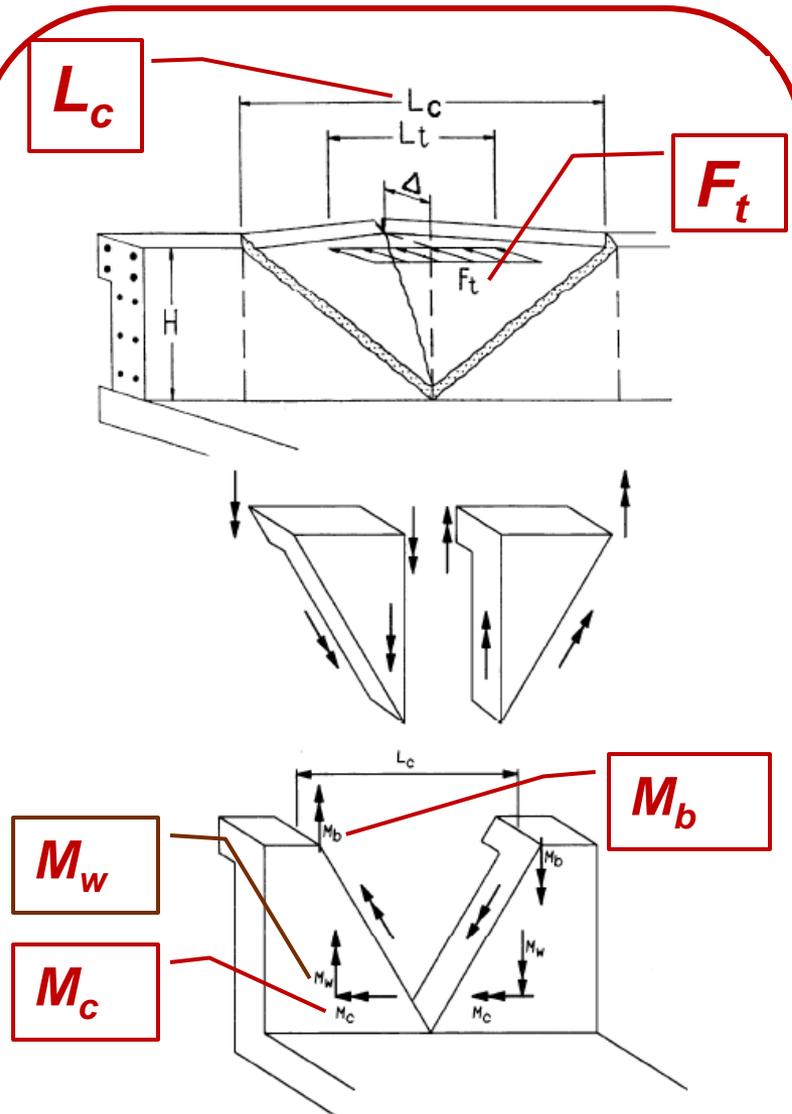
Yield Line Analysis of Concrete Parapet Walls for Impact within Wall Segment
